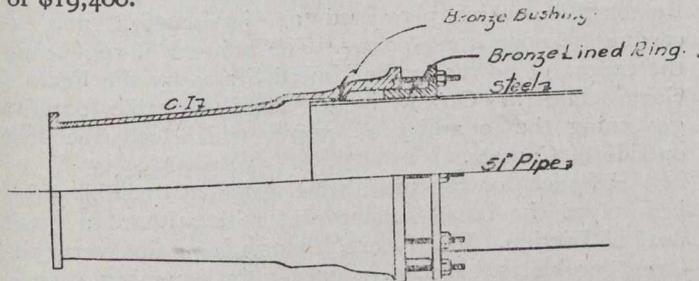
Detail of 51-inch x 42-inch Reducer Expansion Joint.
